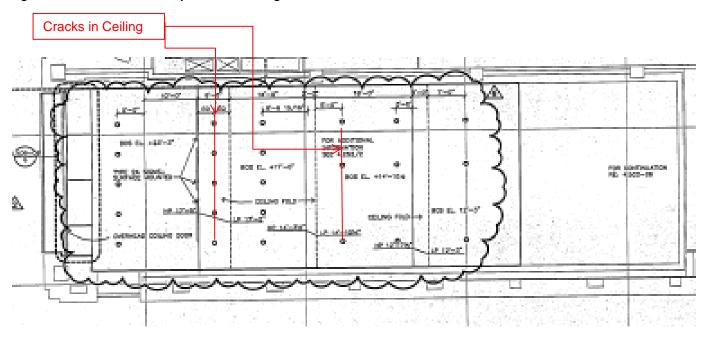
14th Street South Ramp Reflected Ceiling Plan – Concourse Level (Daily monitoring Required)
